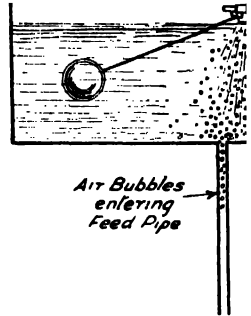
Air-lock in pipes caused by bubbles entering cold feed pipe from ball valve immediately over it.
